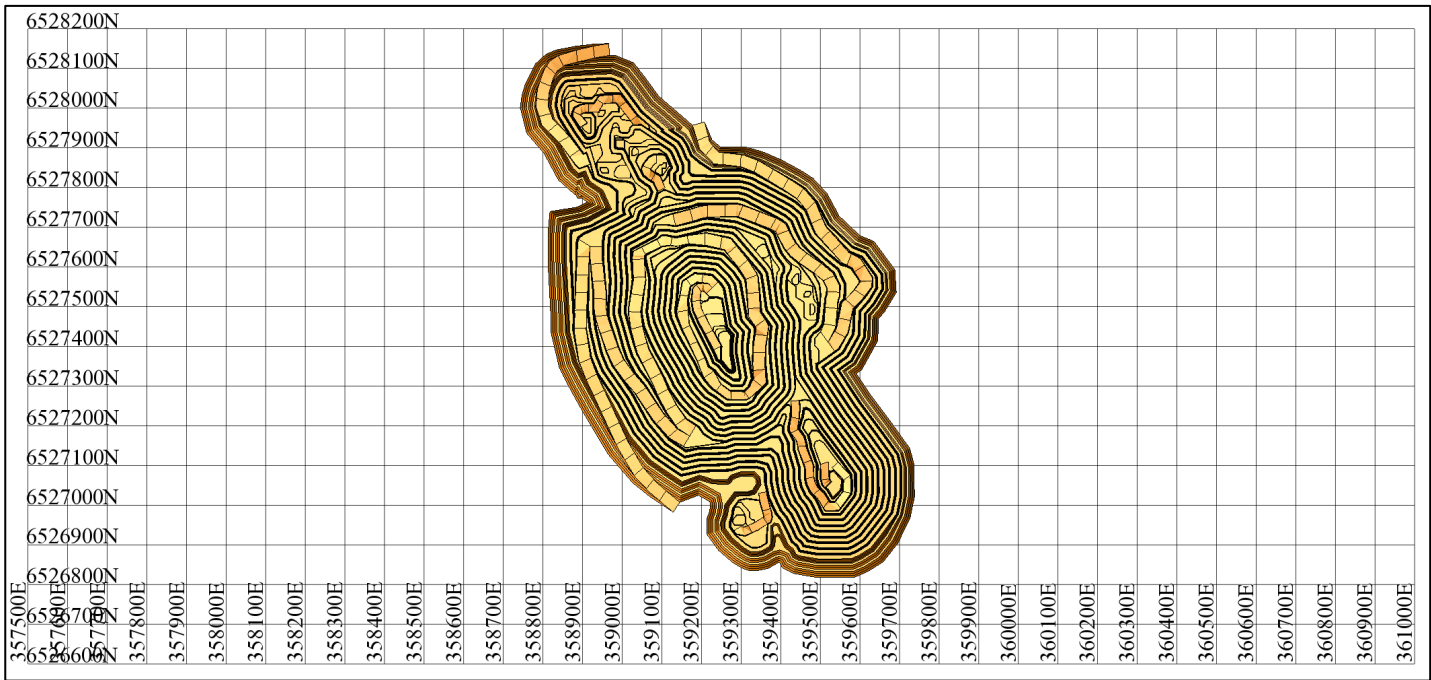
Theia stage 5 pit design – Plan view - Production Case
